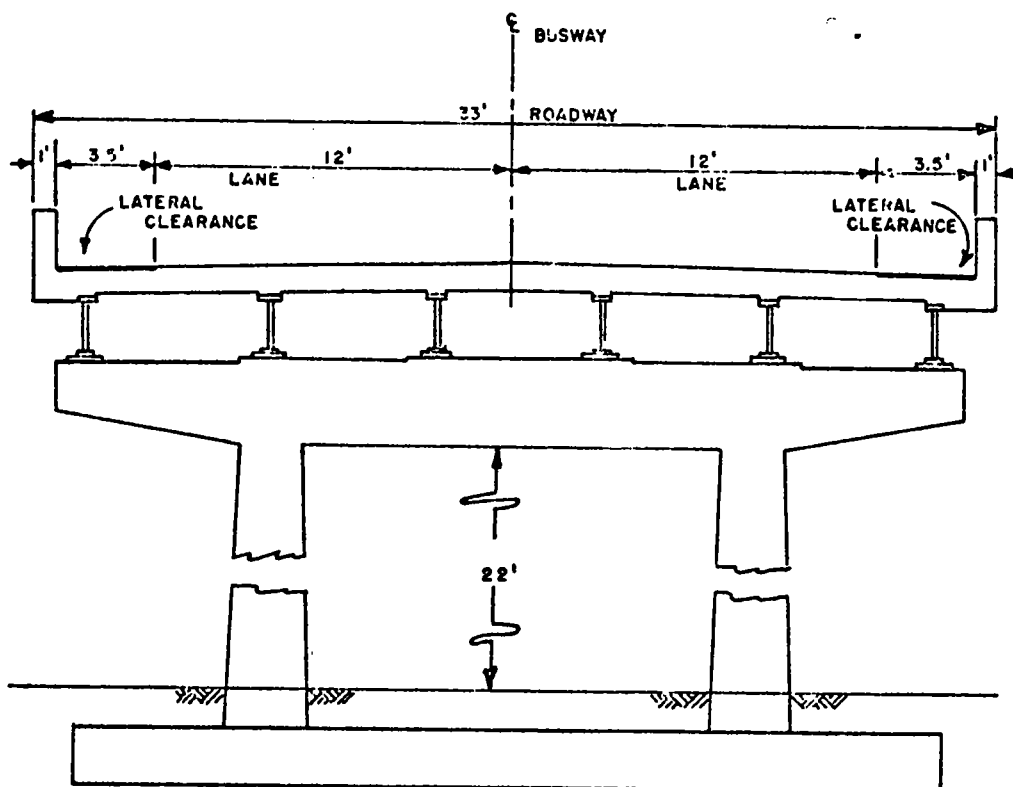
Typical cross section, North Central Busway, Dallas, Tex.
